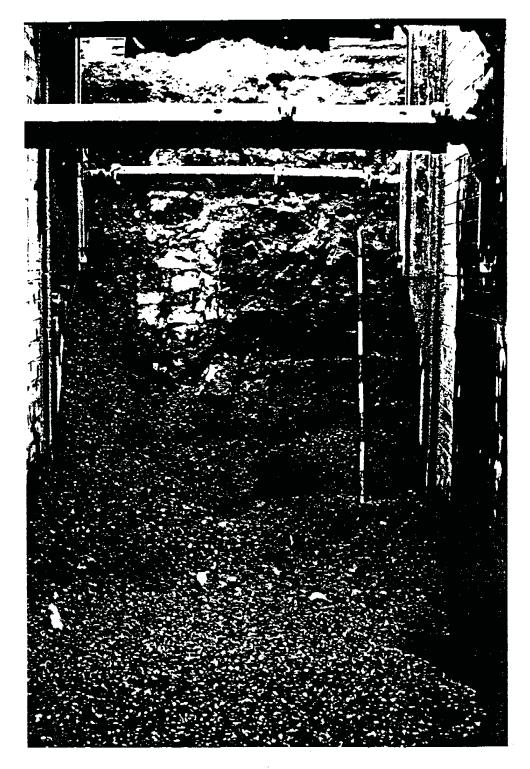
Sewer Trench section along Snargate Street, Dover showing hydraulic shoring and exposed terminal section
